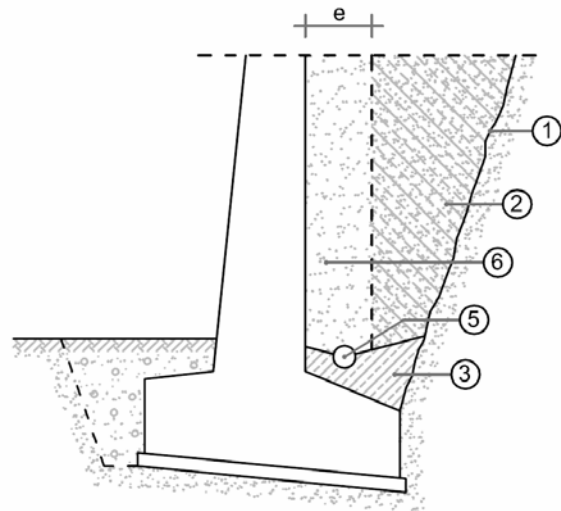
Execution of drainage by means of a single filter (1 excavation, 2 backfill, 3 filling concrete, 5 drainage pipe of  $d_{min} = 20$  cm, 6 filter)
